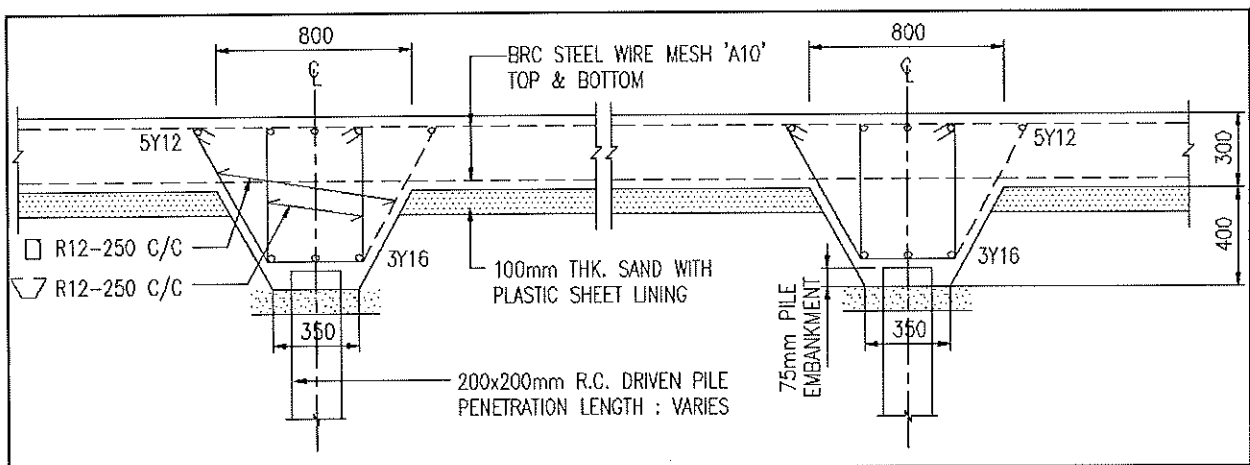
Typical cross-section of strip-raft for low cost apartments.
